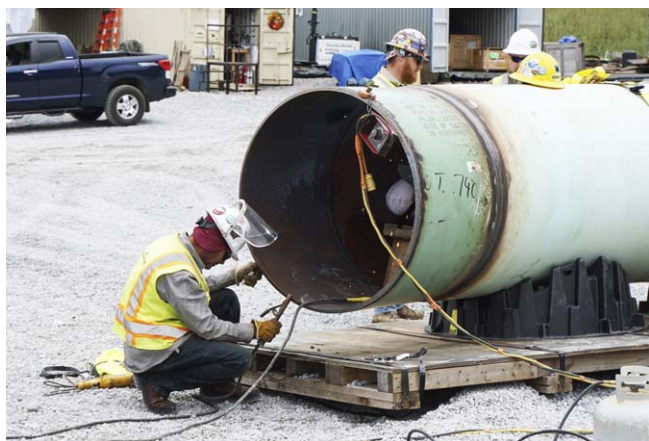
PipePillos supporting pipe while a welder backwelds a fitting on the Mountain Valley Pipeline project in West Virginia, US.
